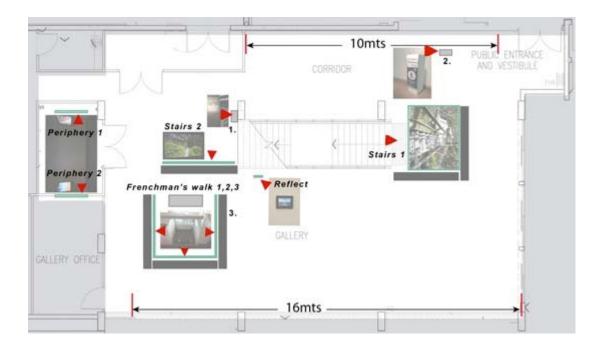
Gallery 61 Floor plan – *Journey: Frenchman's walk* exhibition
